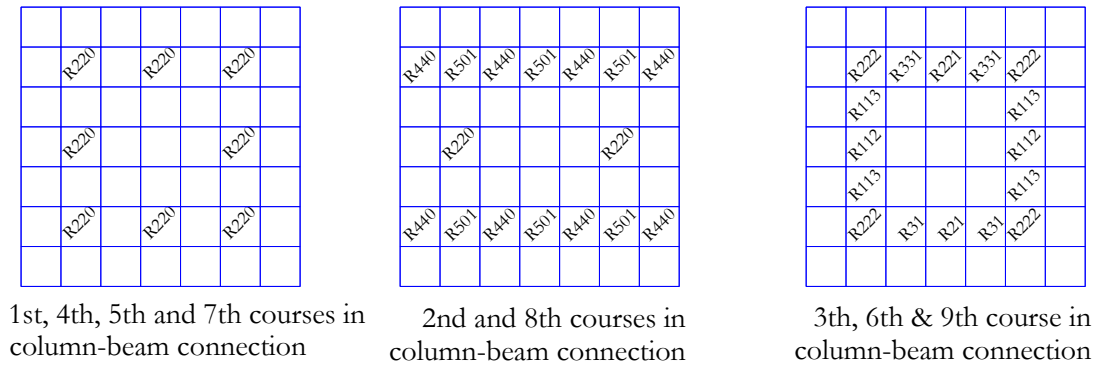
Specimen 1 real constants for the right column-beam connection according to Table B.4
